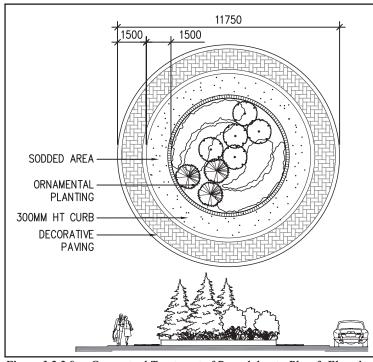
c: Conceptual Treatment of Roundabout - Plan & Elevation
